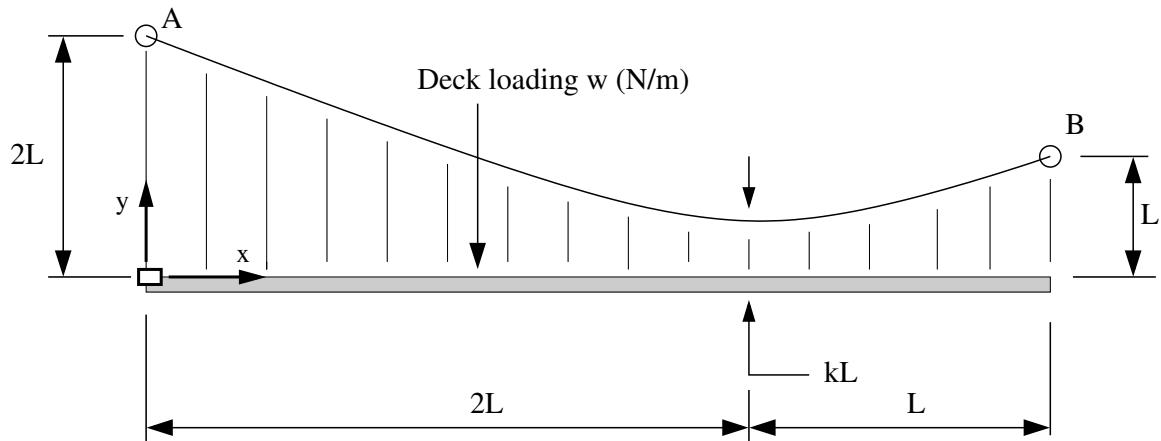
Elevation view of a single cable span in a suspension bridge (not to scale).
